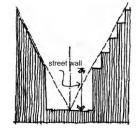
Control of Building Contours in Paris Streets (Source: The Orientation of Buildings or Planning
